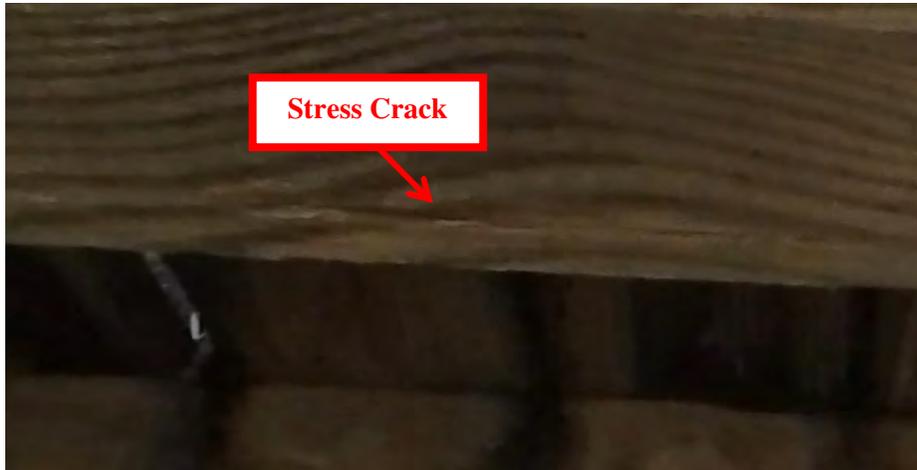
Longitudinal Stress Crack in Center Bearing Beam
